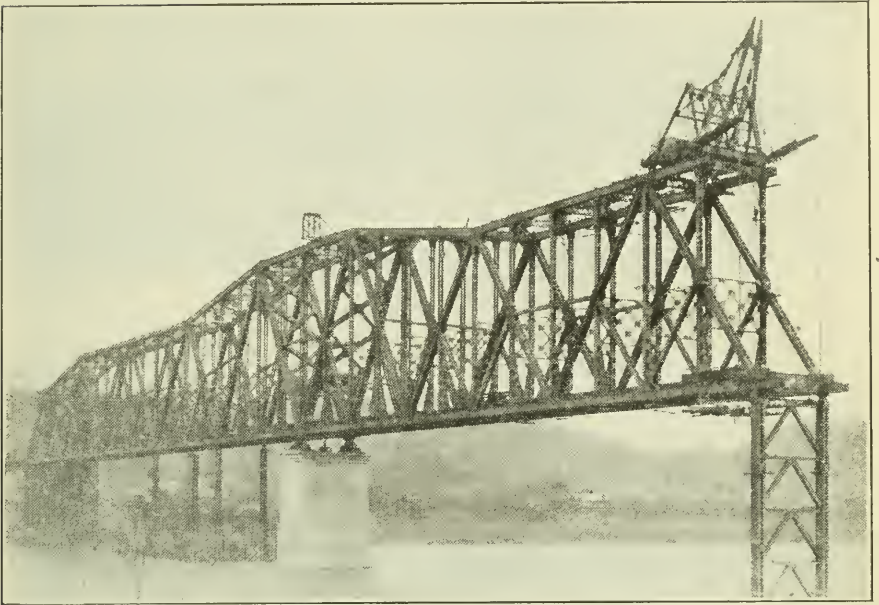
CANTILEVER ERECTION, KENTUCKY SPAN, AND FALSEWORK UNDER OHIO SPAN REMOVED, SCIOTOVILLE BRIDGE.
